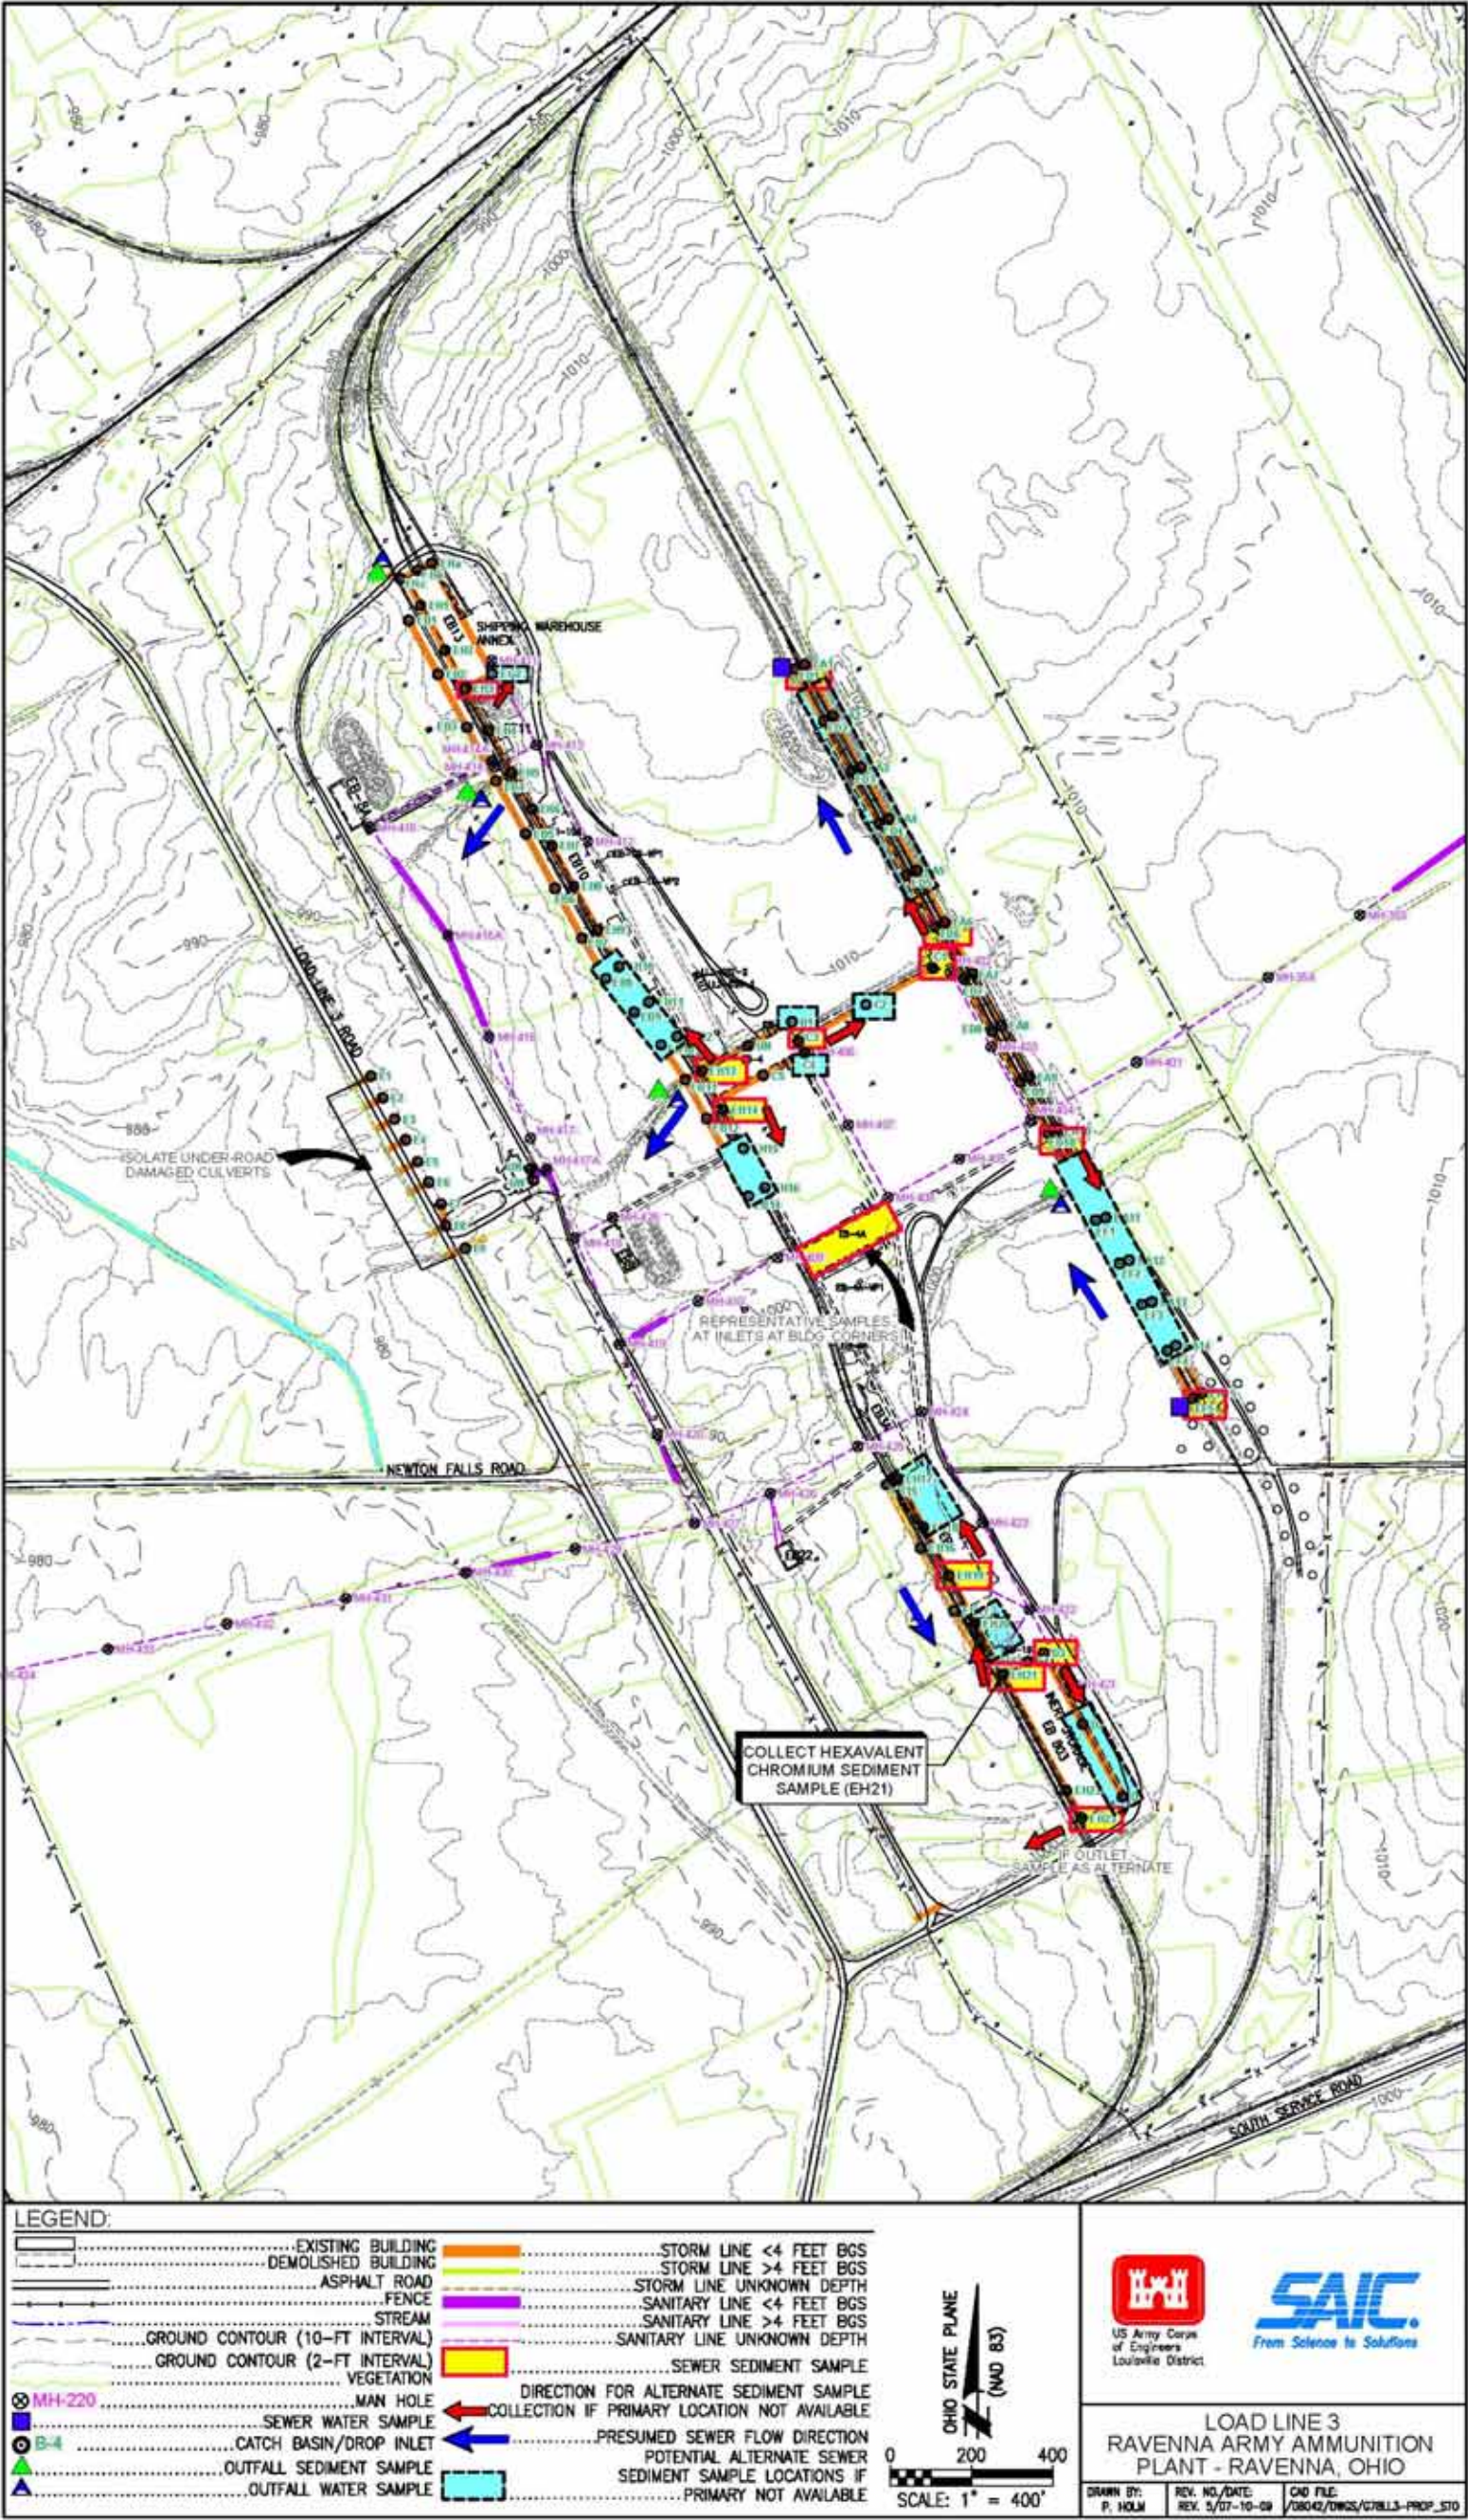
Proposed Storm Sewer Sampling Locations at Load Line 3
